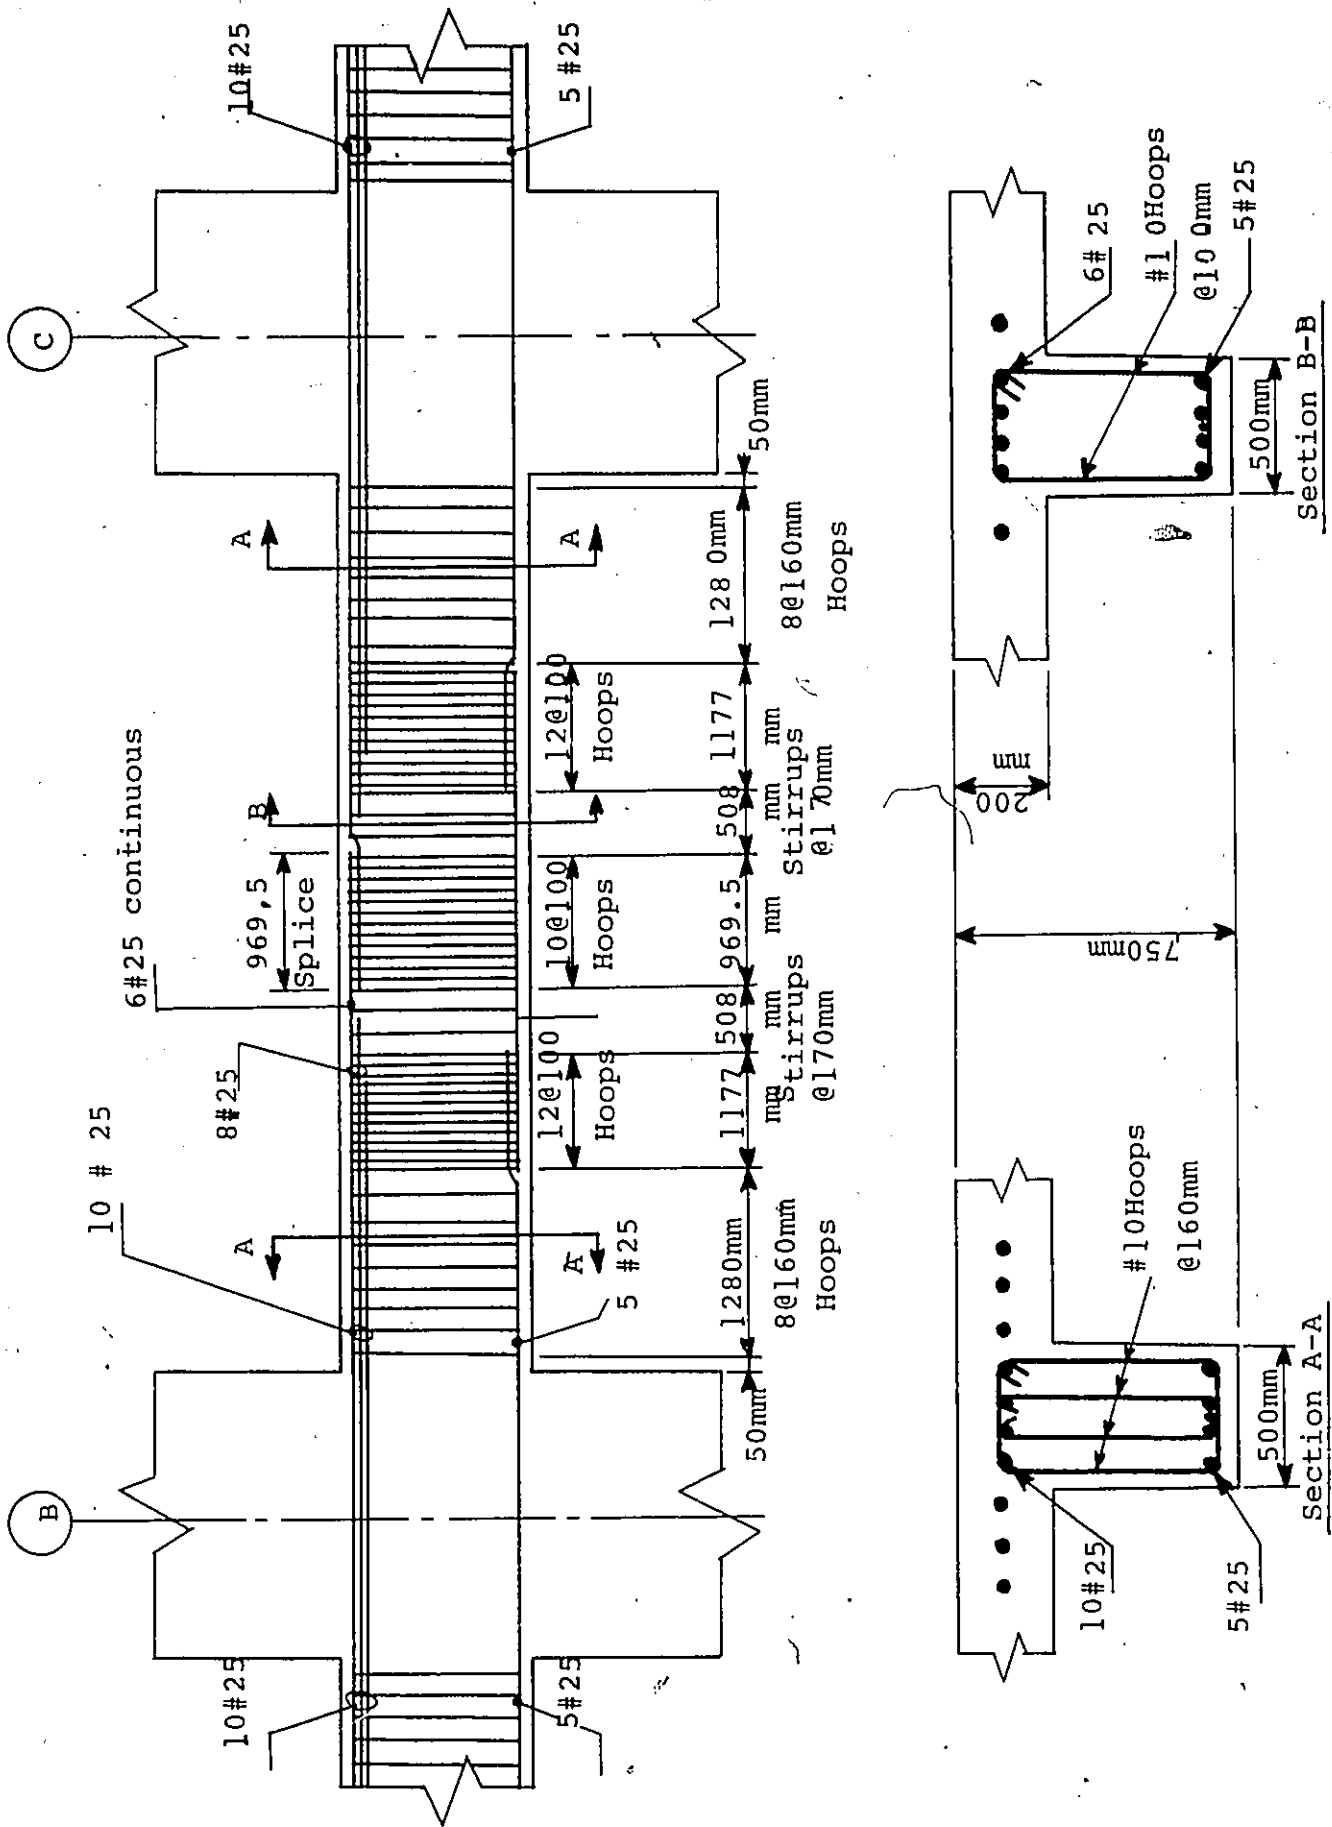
FLEXURAL MEMBER REINFORCEMENT (ACI 318-83)
